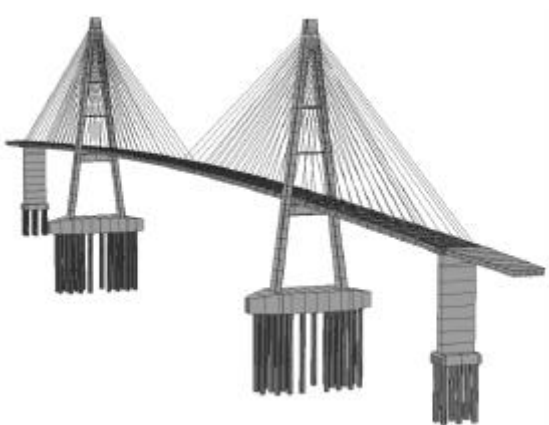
Structural RM2004 model, Rach Mieu Bridge, Vietnam.
